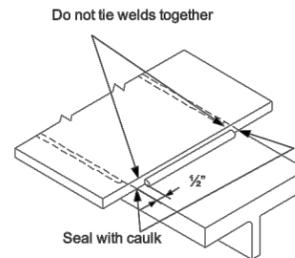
Fillet Welds on Opposite Sides of a Common Plane
